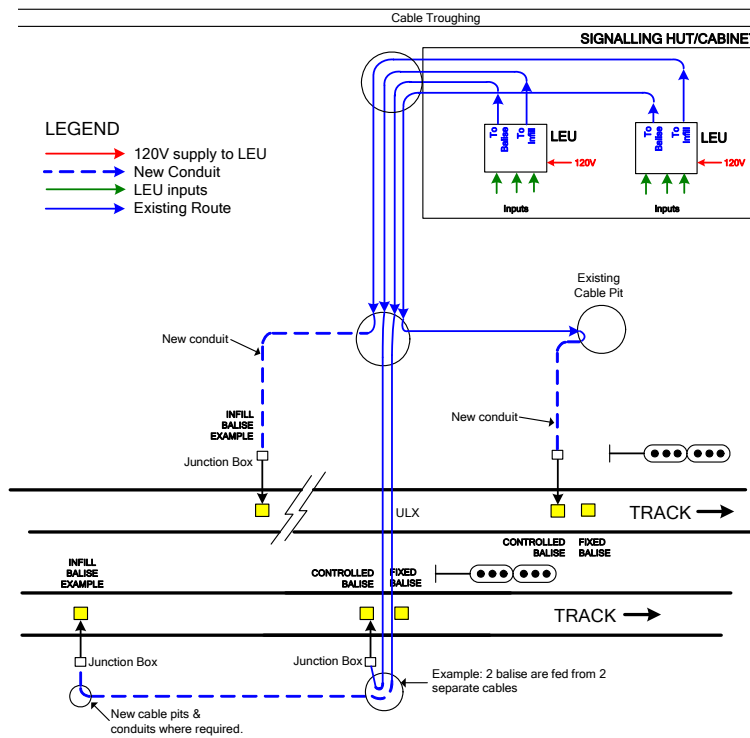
Multi Track showing ULX crossing with separate trunk cables
